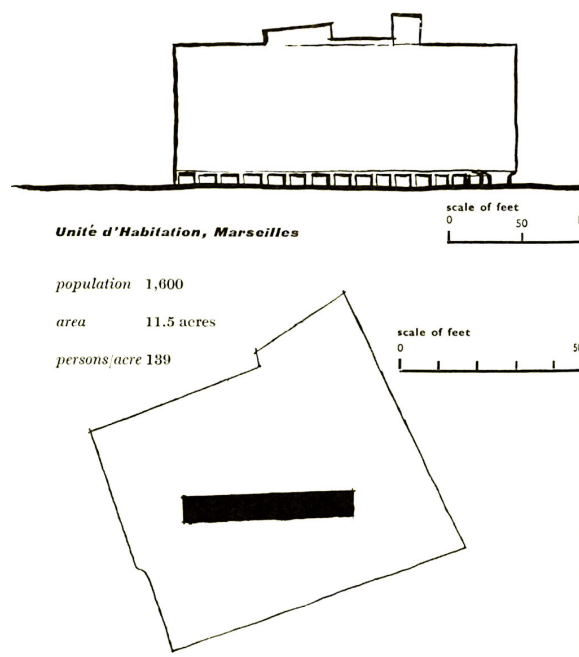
Sketch plan and elevation of Unite d'Habitation.
